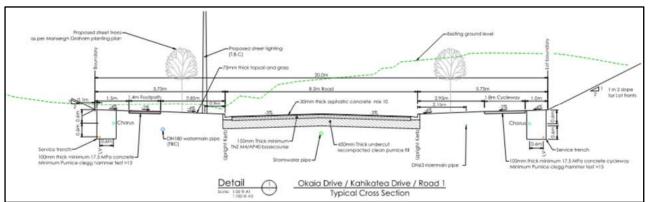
Okaia Drive, Kahikatea Drive and Road 1 Typical Cross Section
